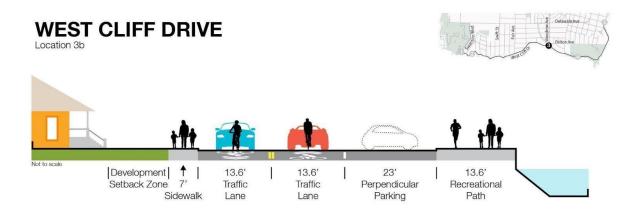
Cross Section of West Cliff Drive Alternative 1 east of Woodrow Avenue
